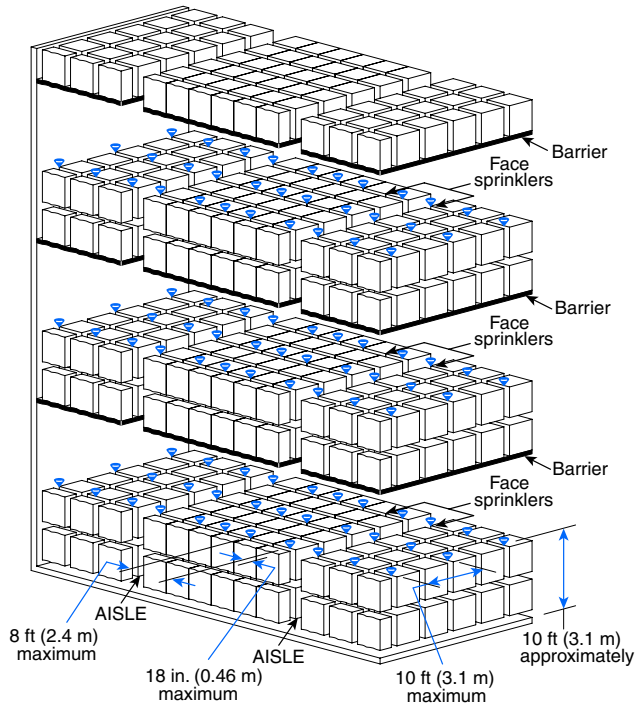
Positioning of In-Rack Sprinklers in
